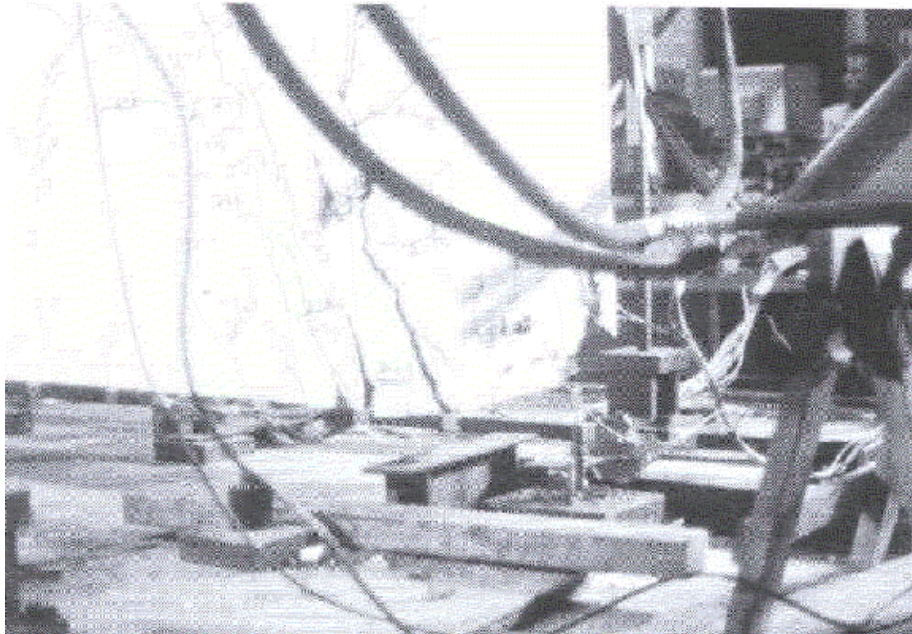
Spalling in the Knee Joint of the As-Built Long Specimen(Adapted from Stojadinovic and Thewalt, 1995)
